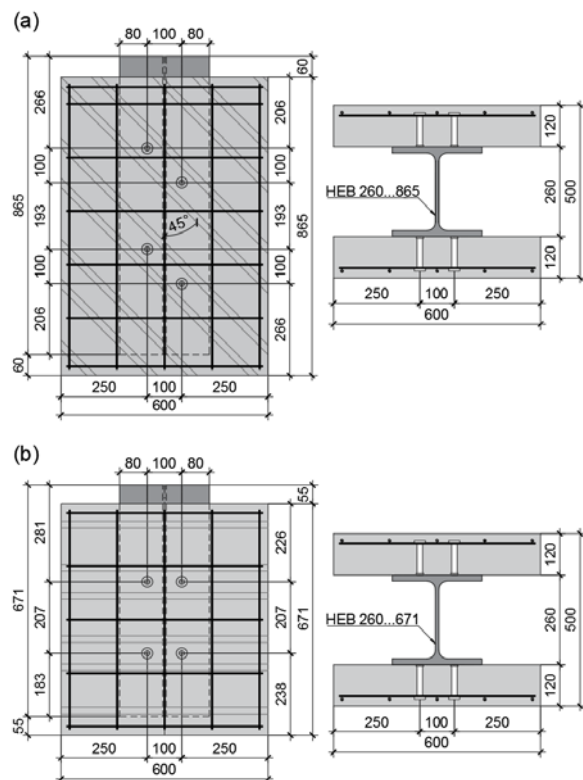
Layout of push-out specimens: (a) specimen S45, (b) specimen S
